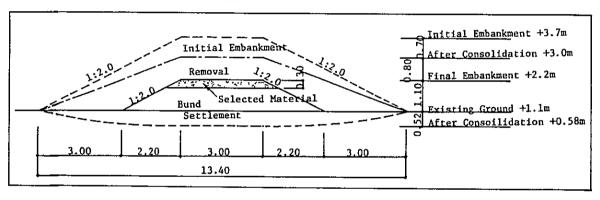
TYPICAL CROSS SECTION OF THE BUND
